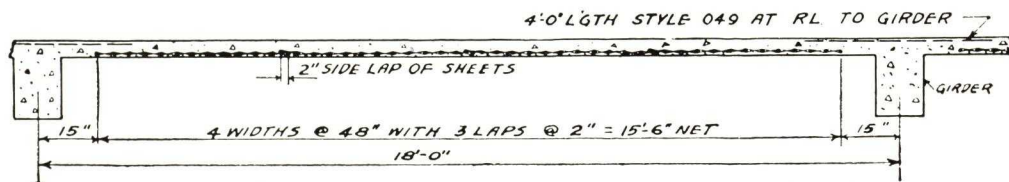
, Detailing Widths of Wire Fabric and Showing Extra Strip of Fabric Over the Girder
